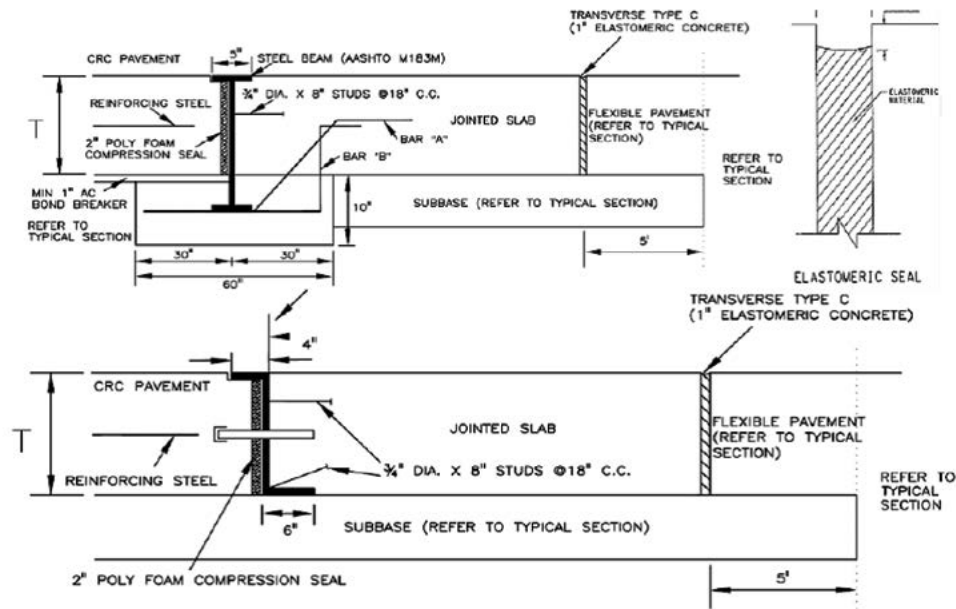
Transition between CRCP and asphalt pavement using an elastomeric seal.
